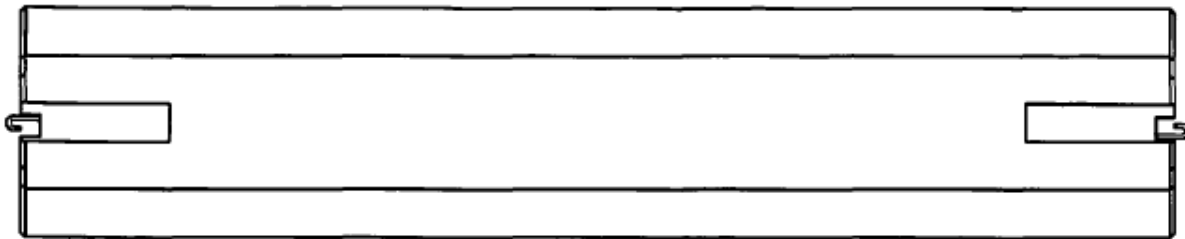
JJ-Hook Connection, Elevation View, Test Nos. 690900-IND2 and 690900-IND3 [44]
